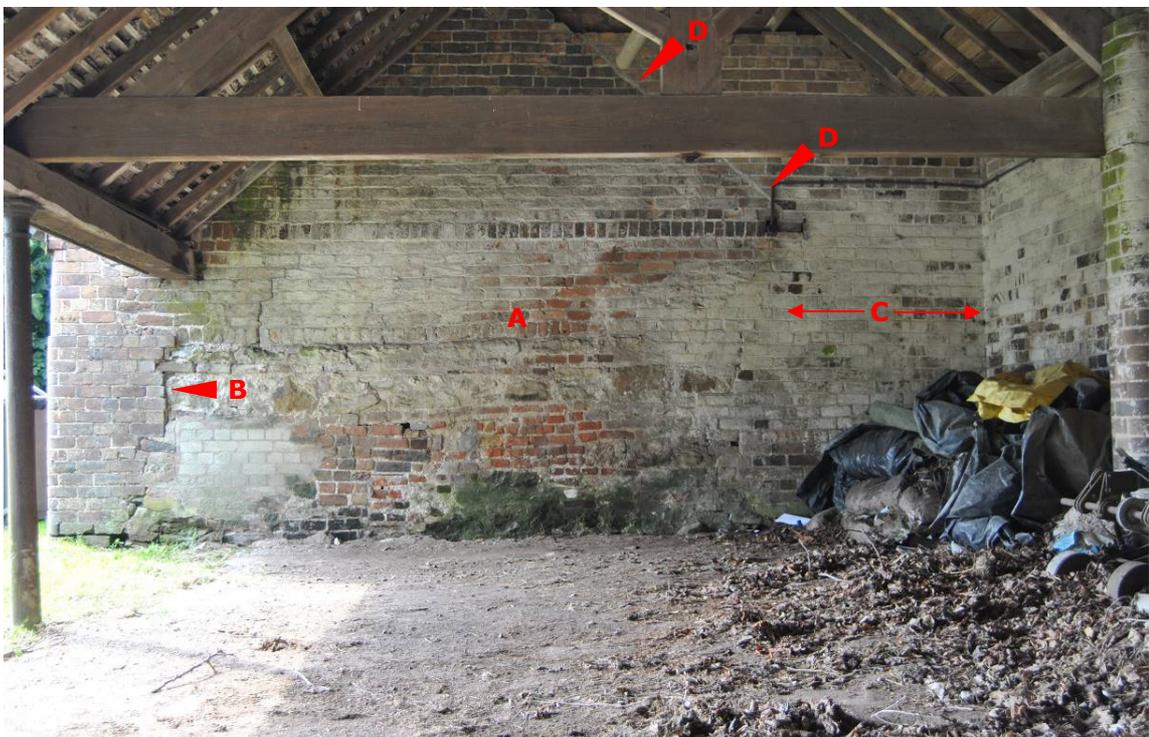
Cart Shed G; multi-phase brickwork of north wall incl. (A) limit of rebuild and (B) former gable of Building H.
